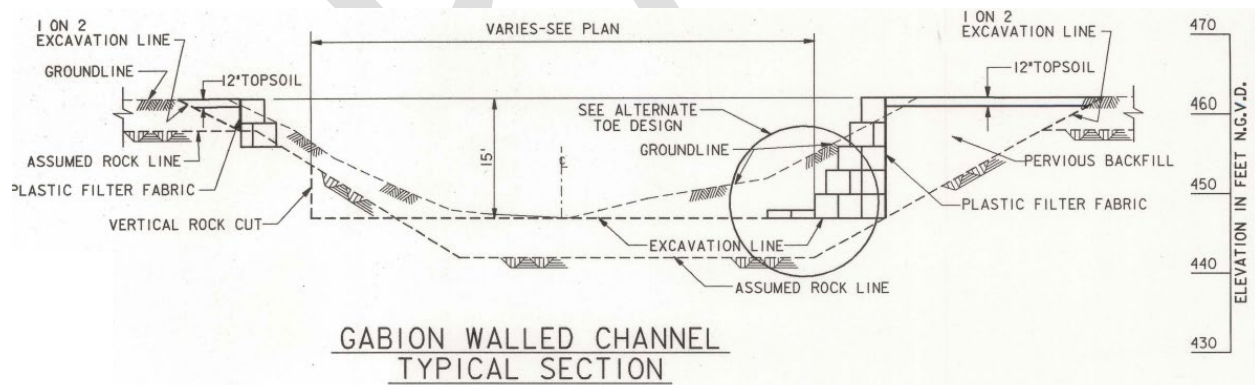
Gabion walled channel cross section (channel modification) from 1988 Feasibility Study.
